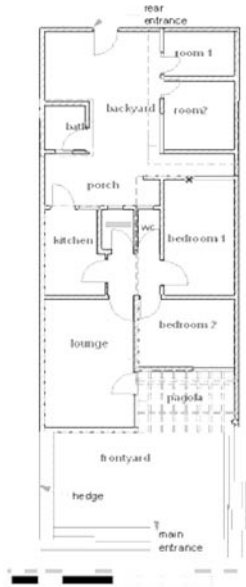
Floor Plan of Buru-Buru DU and extension (author, 2010)
